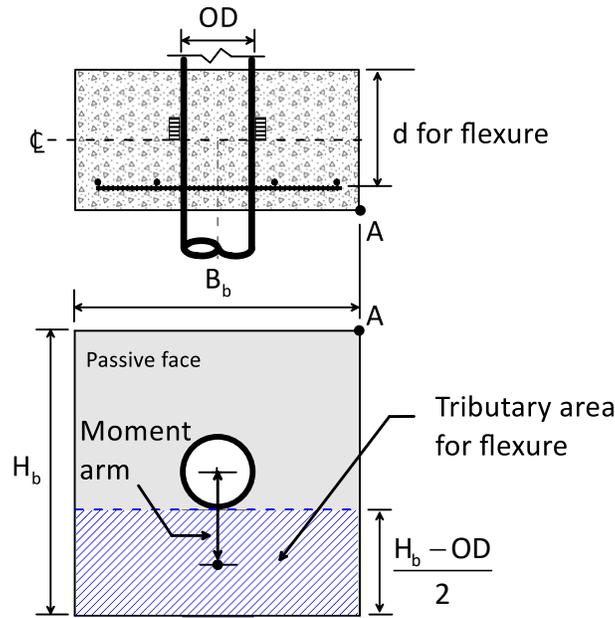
Moment at center of anchor block for 8-in. pipe example
